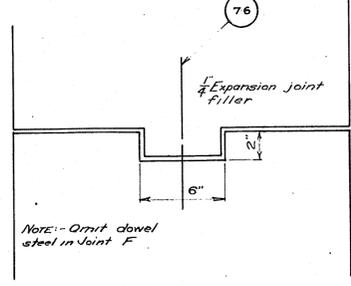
DETAIL OF EXPANSION JOINT E UNDER CENTER PIER
